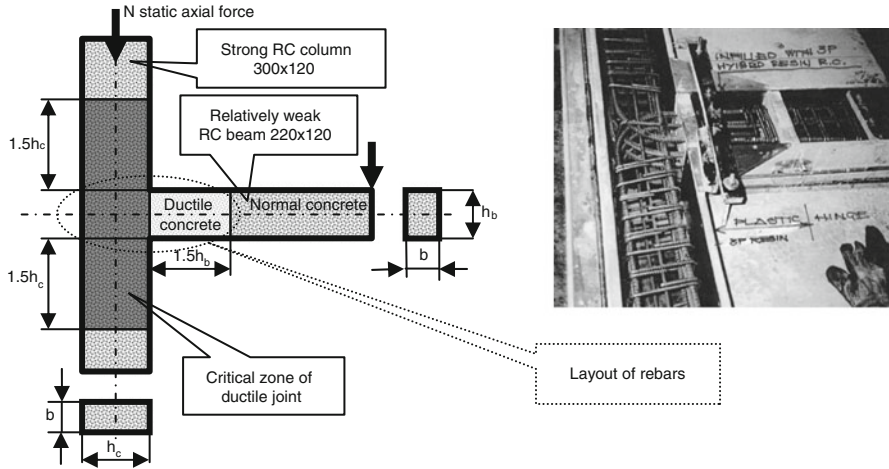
Test specimen, concrete grade C16, steel B60.40
